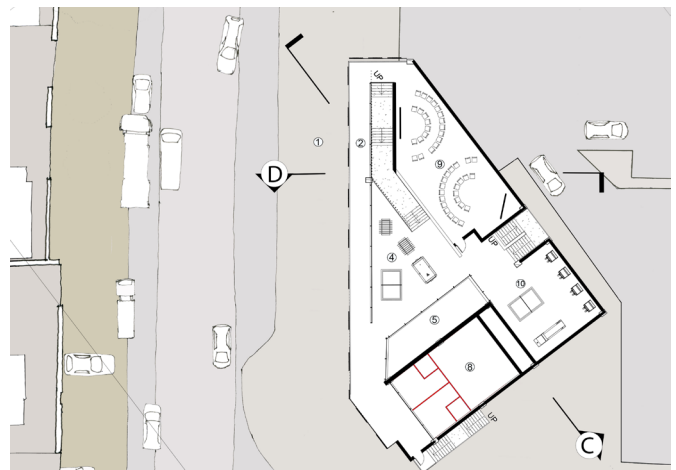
Site 4 1st floor Recreation room and A/V Lounge
